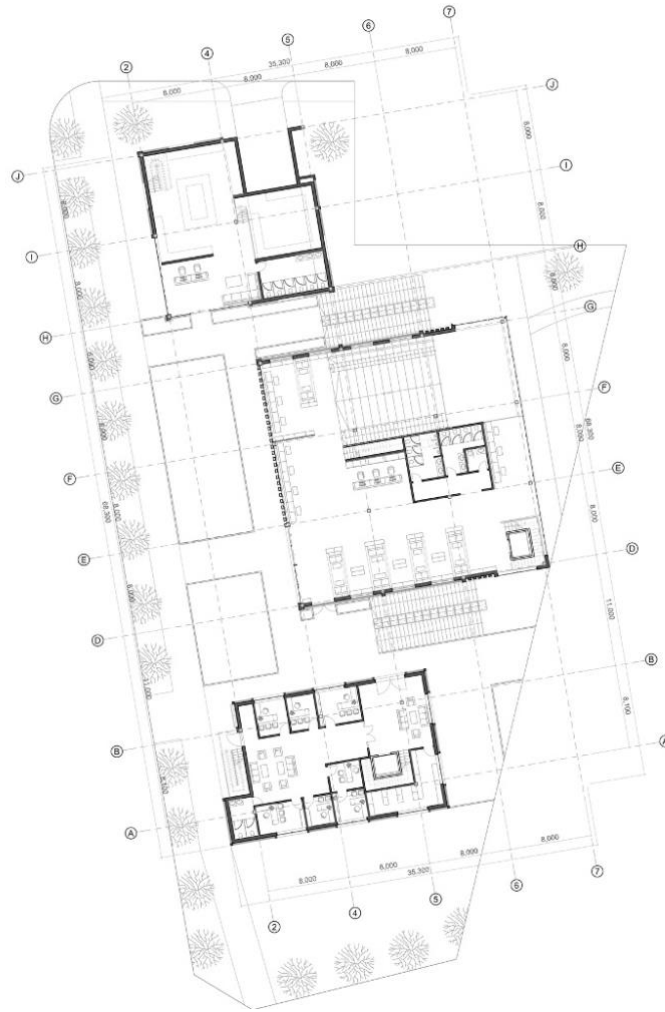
First-floor plan of the multifunctional public library (not in scale) by the author.
